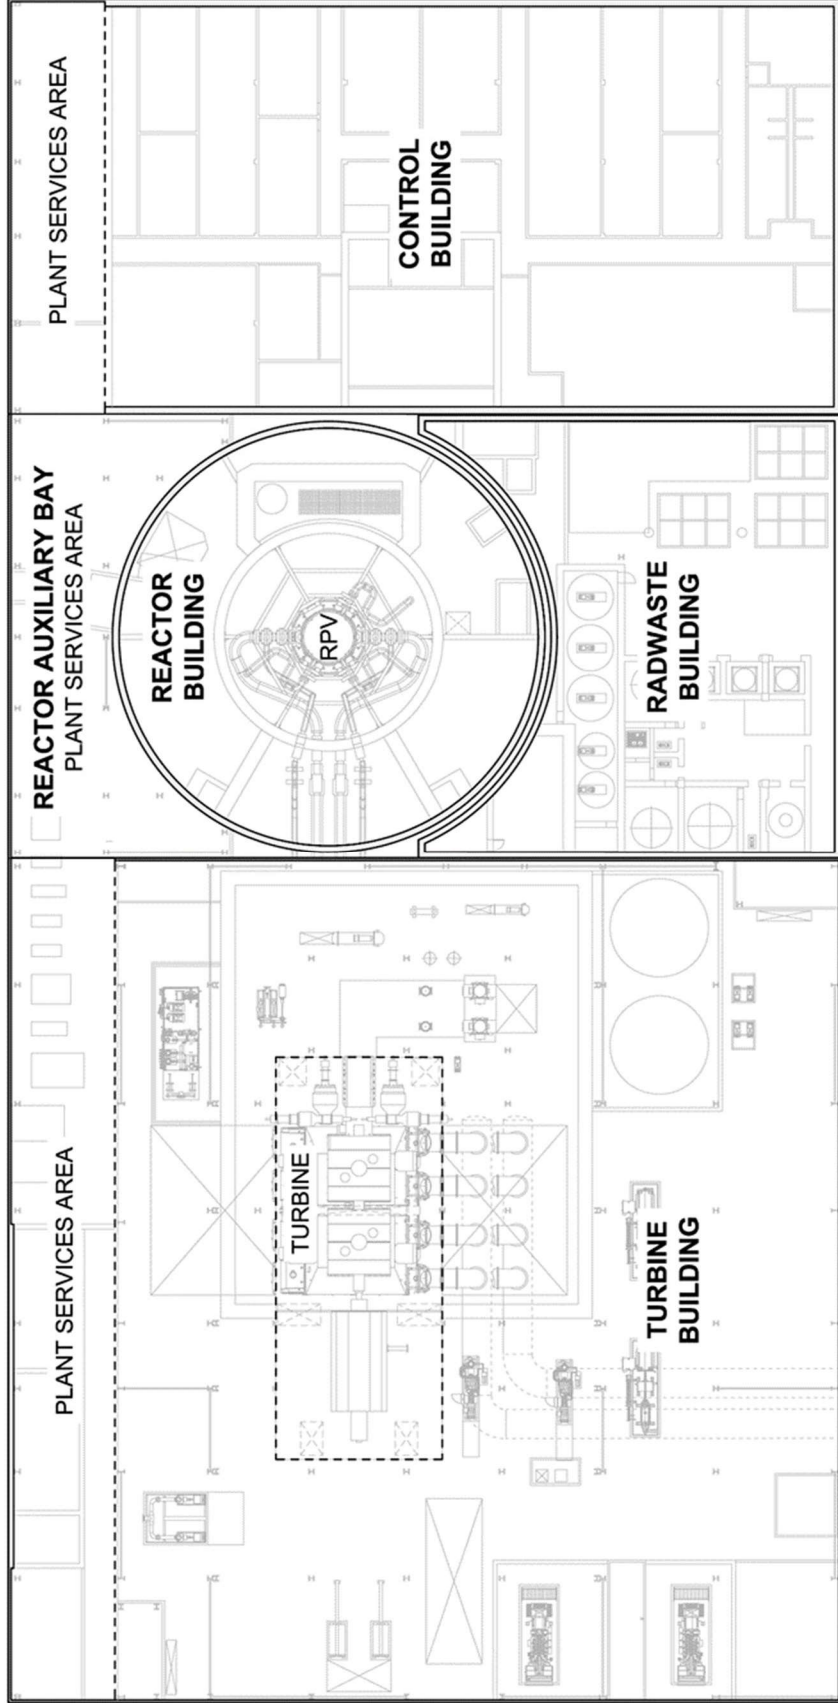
BWRX-300 Power Block Plan View at Elevation 0
